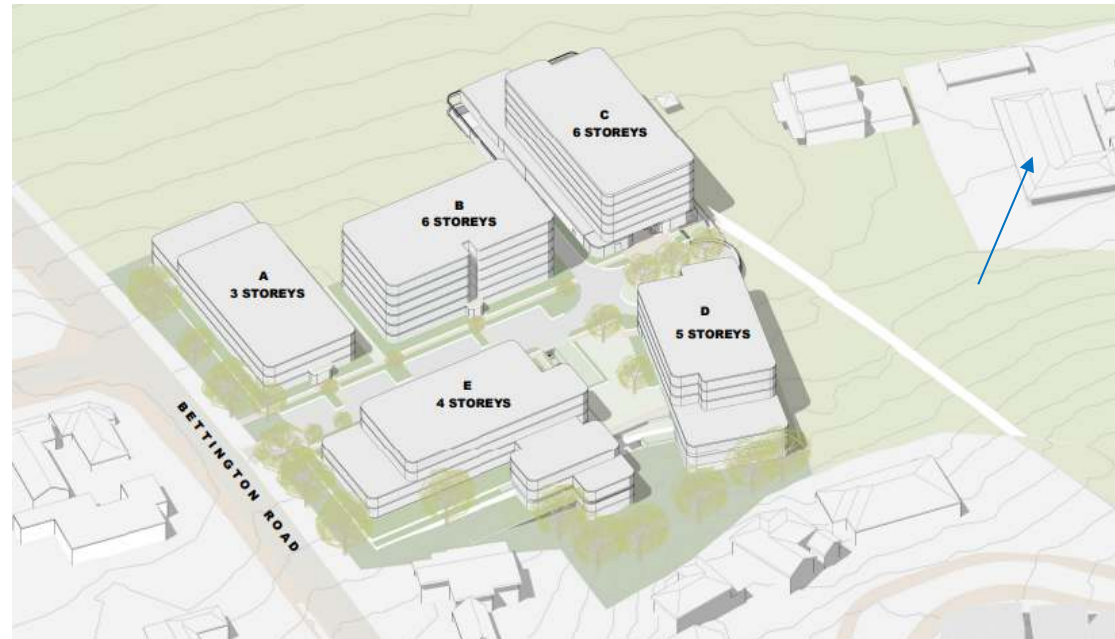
Proposed development plans, Oatlands House is indicated by the blue arrow. Source: Mirvac.
